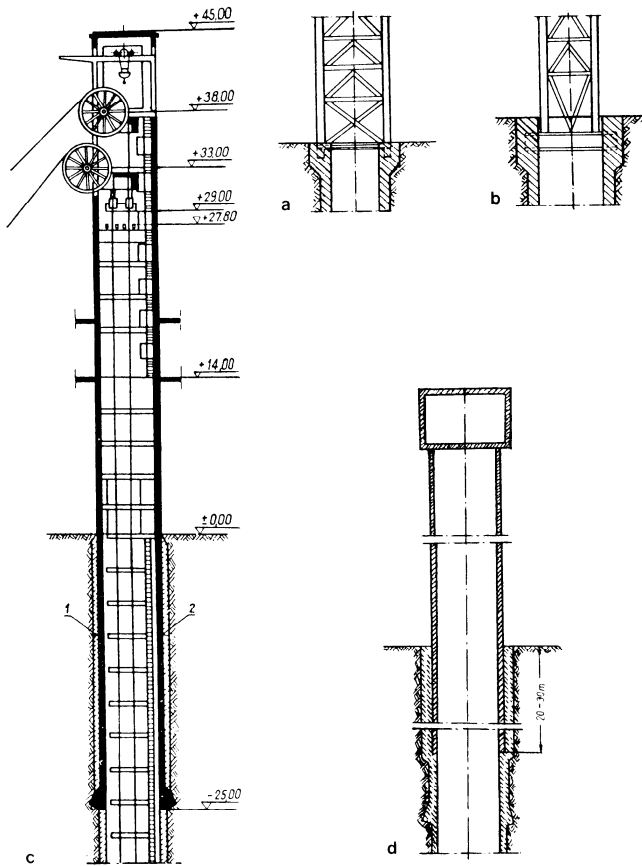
Sections through headframe and headgear foundations: (a) foundation on shaft head; (b) foundation on beams located in shaft collar wall; (c) circular headgears founded on shaft head, comprising concrete shaft head and reinforced concrete headgear. Dimensions in meters. (After Unrug, 1985.) Conversion factor: 1 ft = 0.3048 m.
